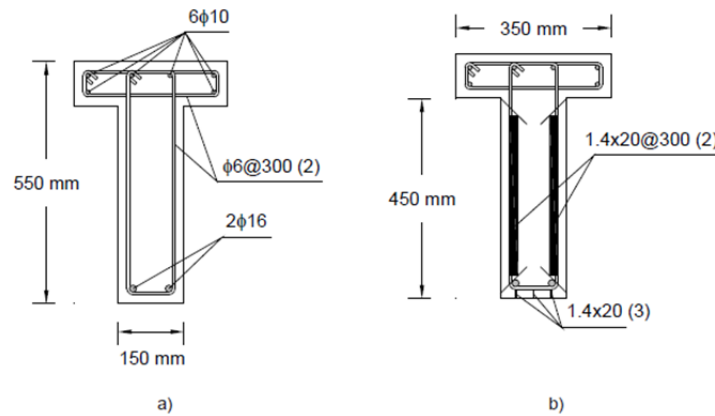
T-beam cross section geometry, a) before and b) after CFRP laminate strengthening
